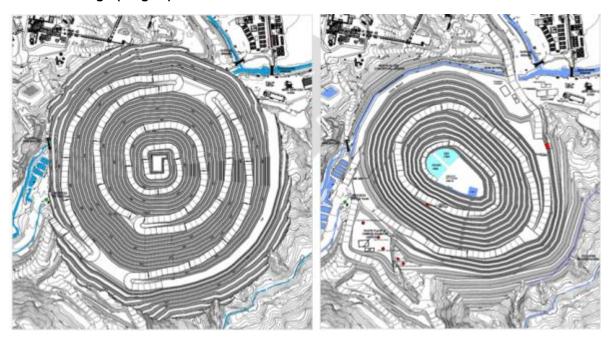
Pre-Study Pit Design (Stage Six) on Left, New Design on Right.
